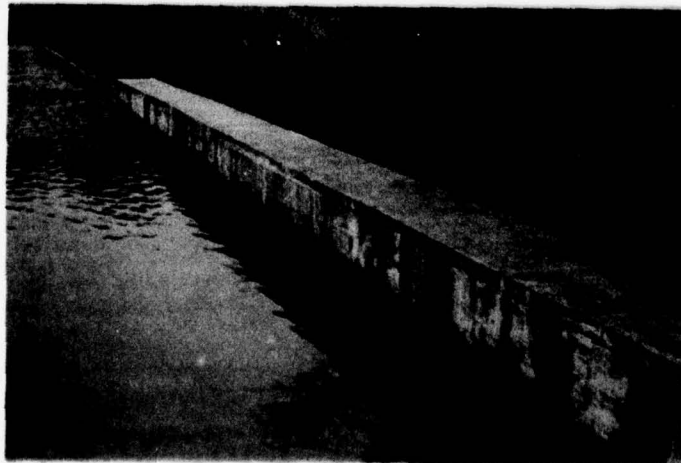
Upstream view of the right abutment non-overflow abutment section
